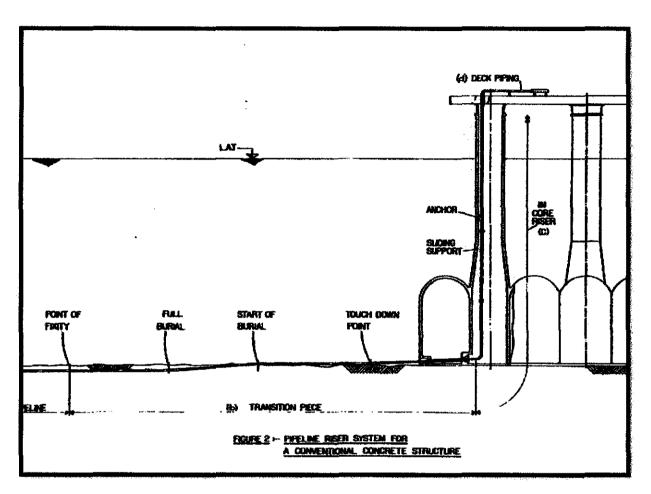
Pipeline Riser System for a Conventional Concrete Structure
